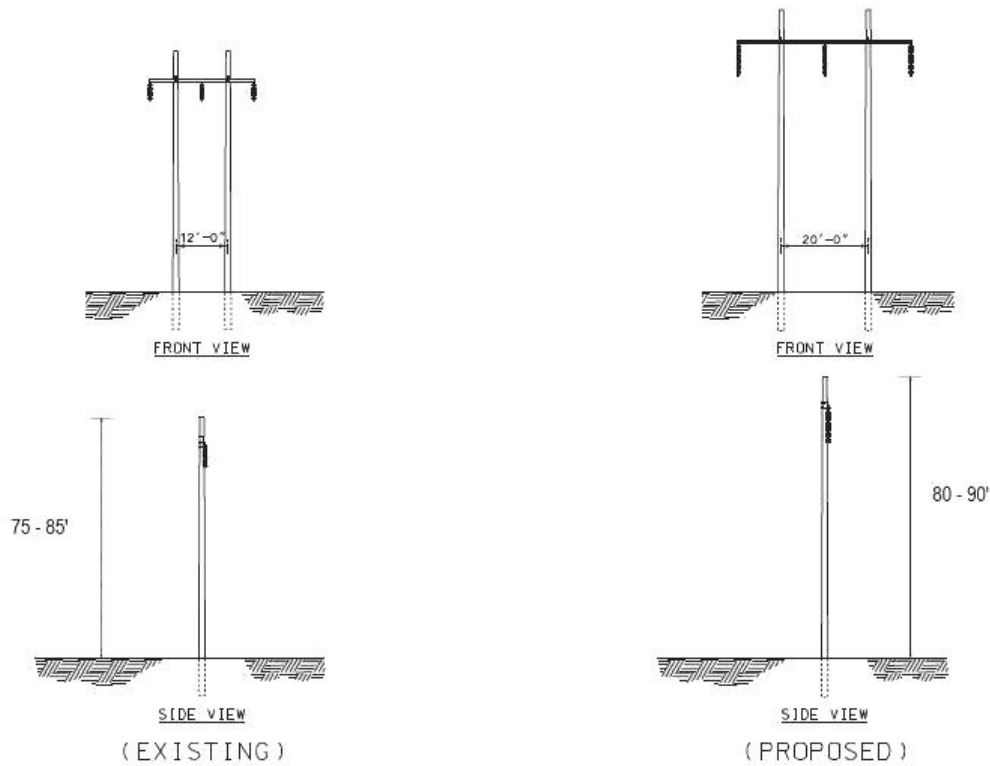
Existing wood structures and proposed replacement wood structures for the Palisades-Goshen Transmission Line (to be used at all locations except structures 1/2 to 2/7 and 4/1 to 4/8).
